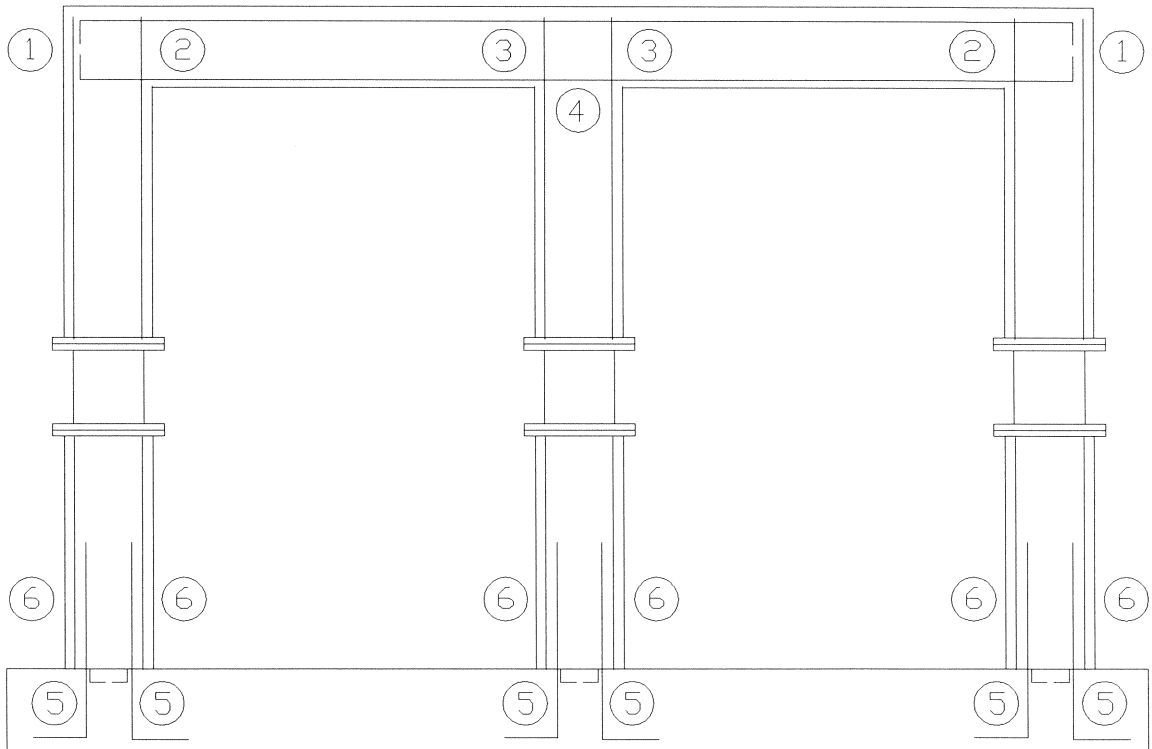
Location of spliced and anchored column steel bars of model pier.
